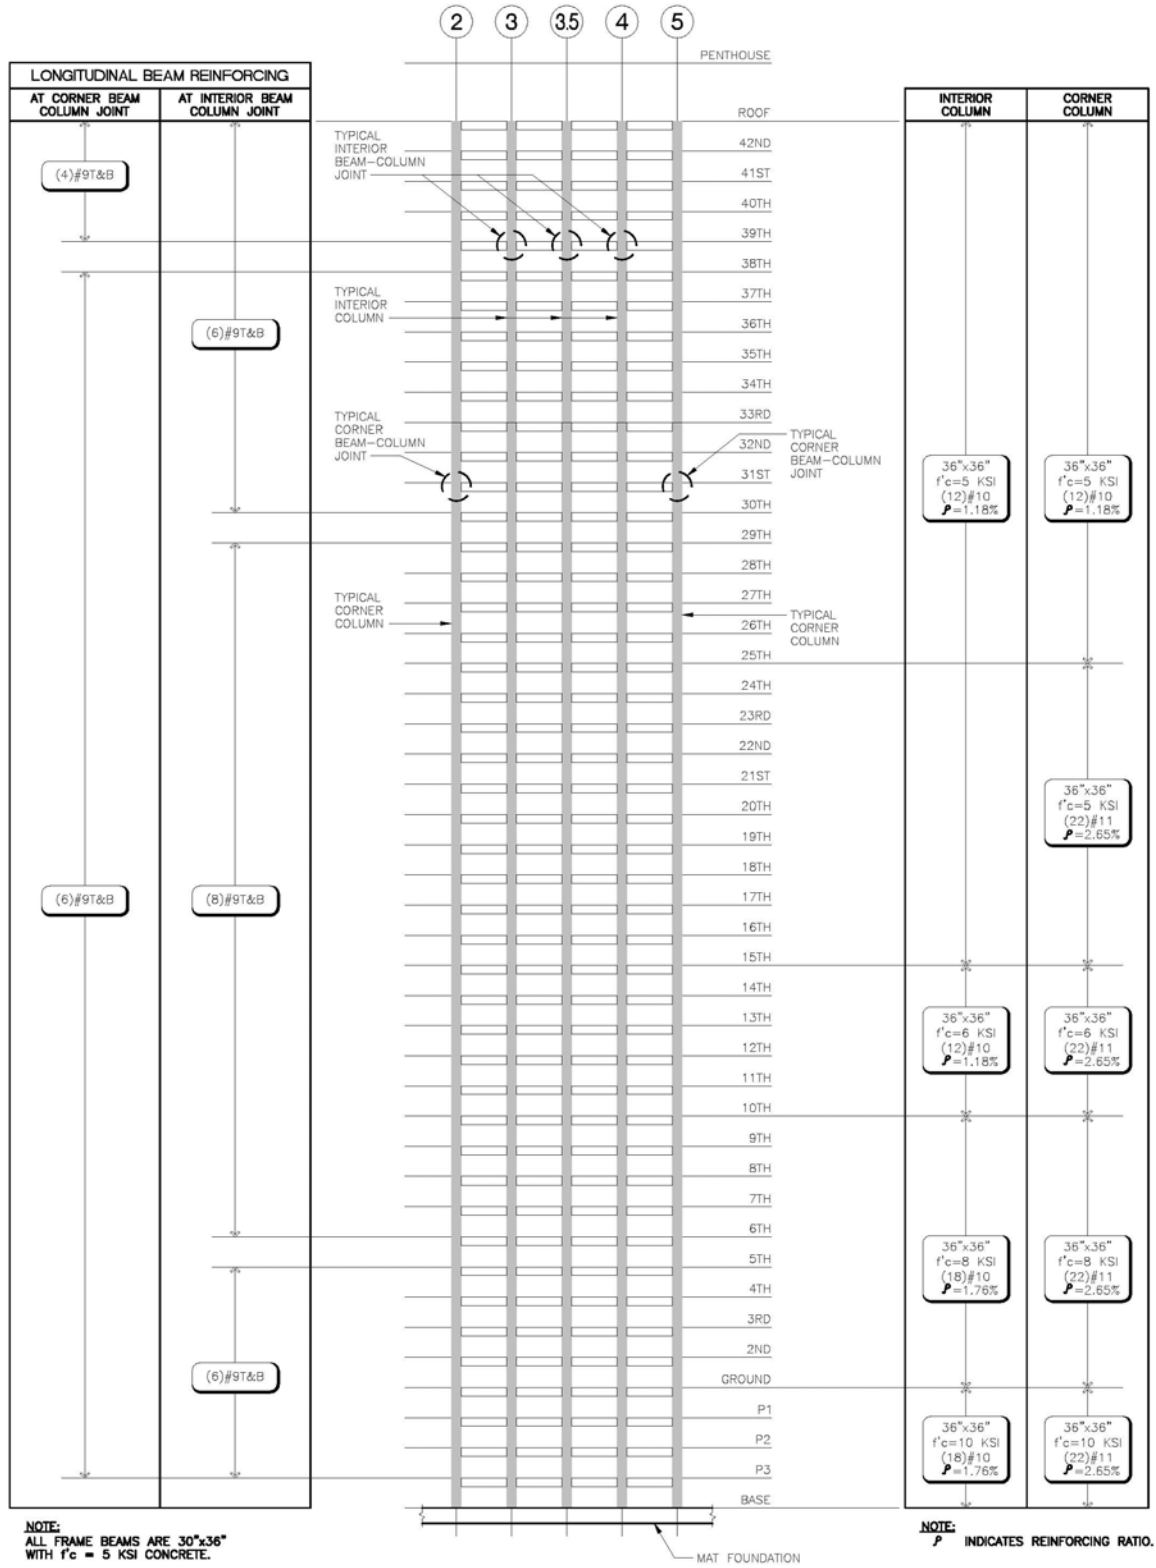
Elevation and Properties of Frames A and F for Building 2A
